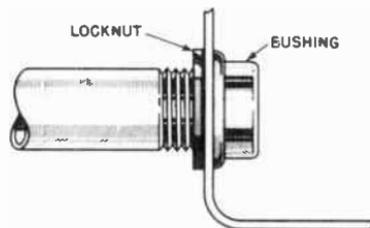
How locknuts and bushings are used to fasten rigid conduit to a switch box or other metallic enclosure.
